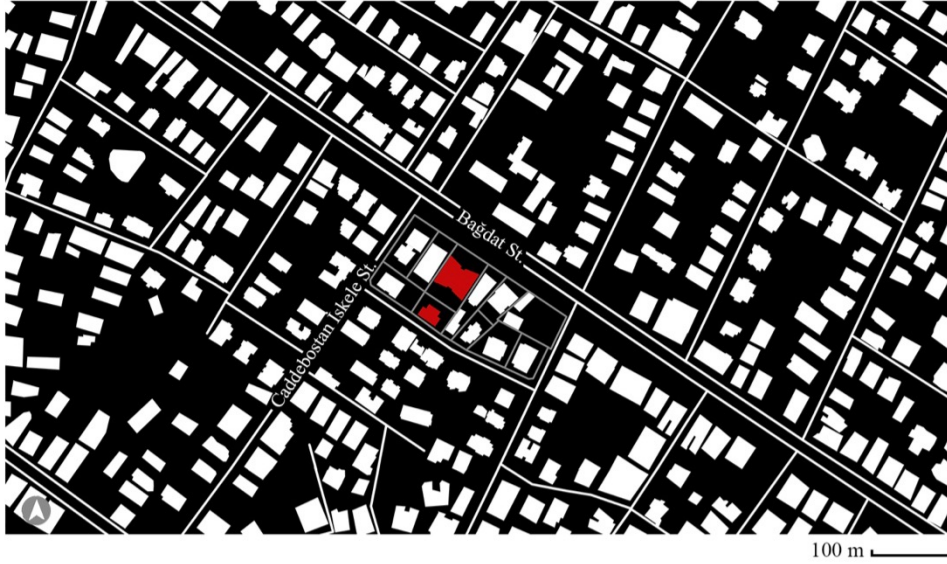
Case B Site Plan (Serbetci-Suveydan Archives)
